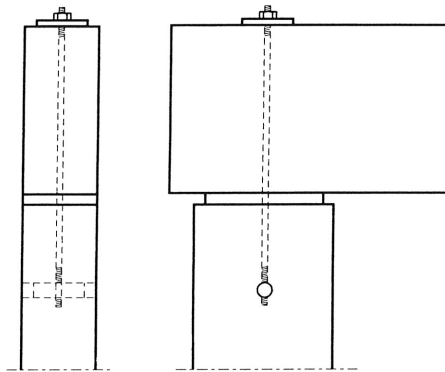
Joint with a vertical bolt screwed into a round steel bar with a threaded hole. The hole in the column is plugged after assembly. The bolt should be retightened, especially for deep beams.
